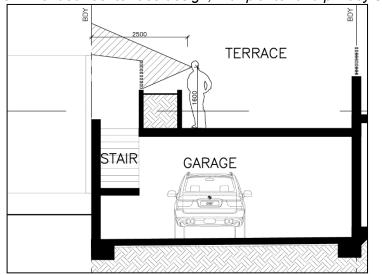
Cross-section through proposed terrace, with privacy screen and planter
